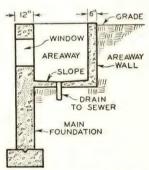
Section at B-B of Areaway Wall in Foundation Shown in Fig. 3
